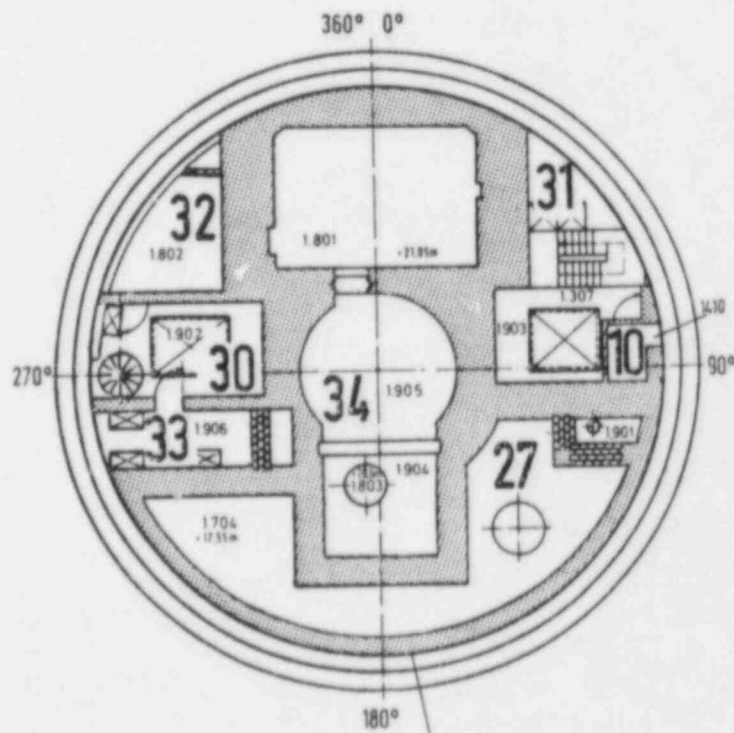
Plan of HDR containment at level J-J (+25.3 m) (34-zones model)
